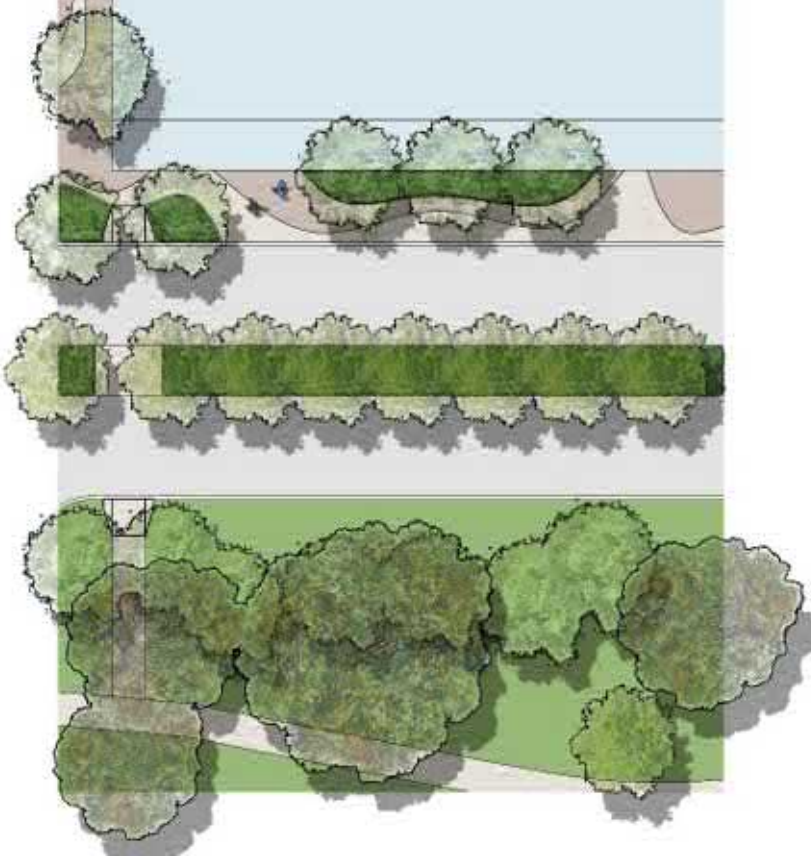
Stoneham Street (Plan Extract and Indicative Section)
